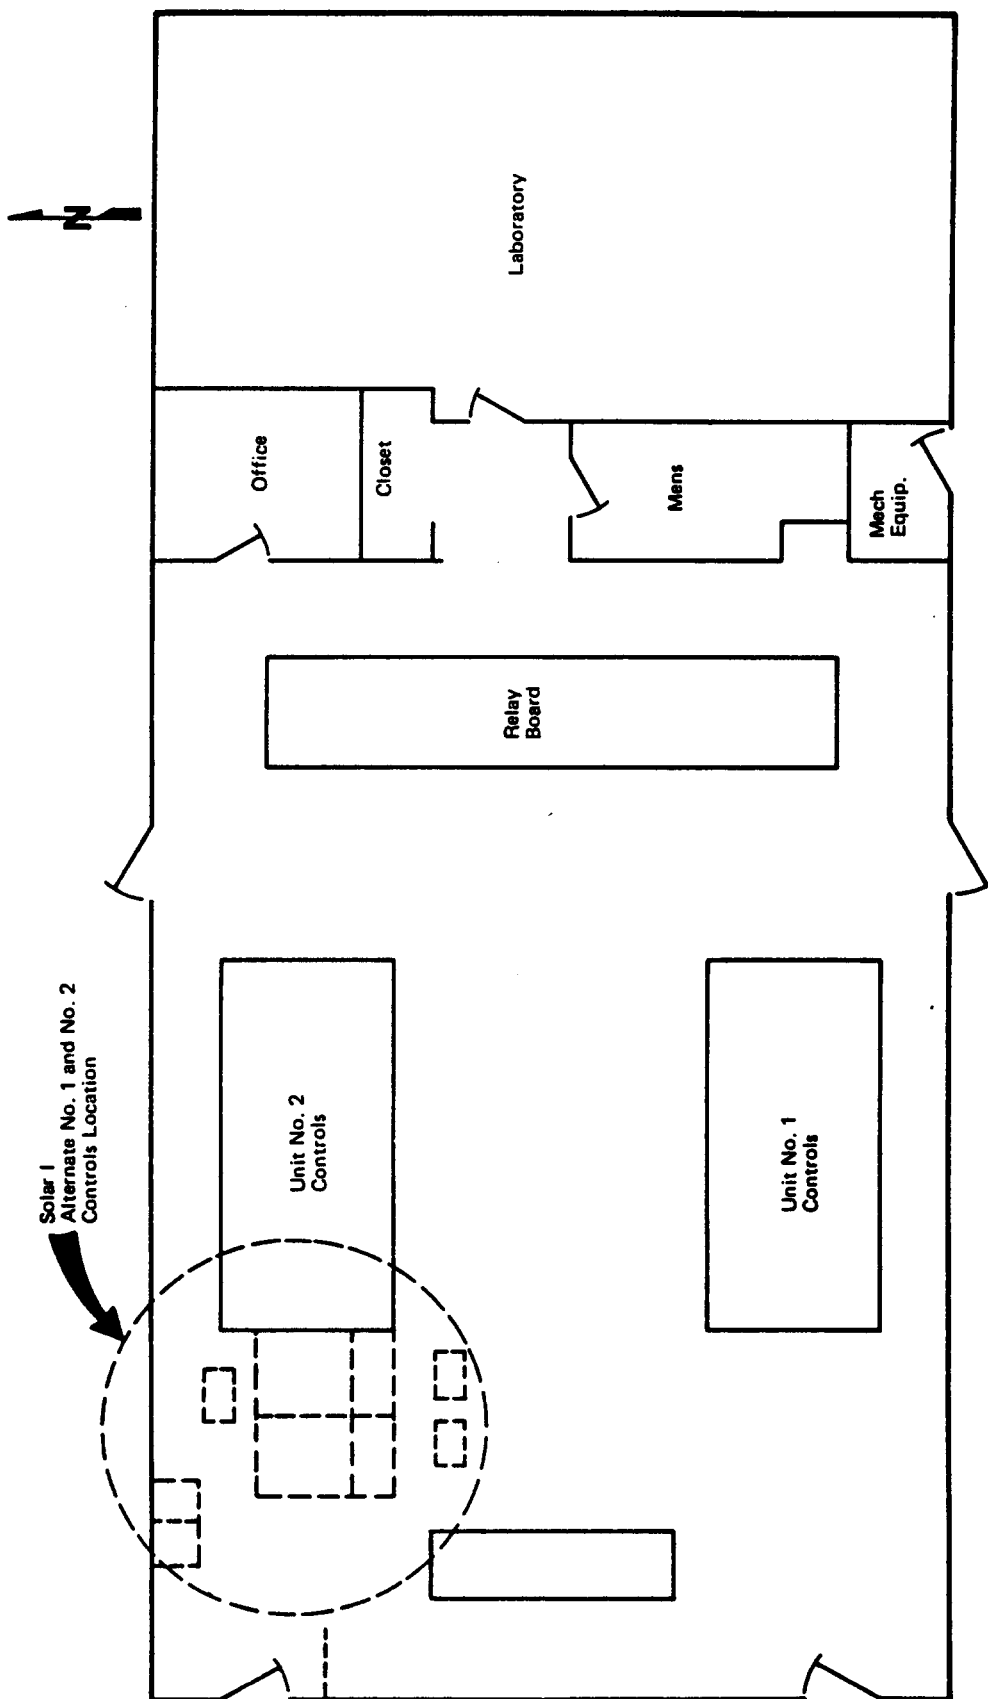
Proposed Solar 1 Equipment Layout at Coolwater
